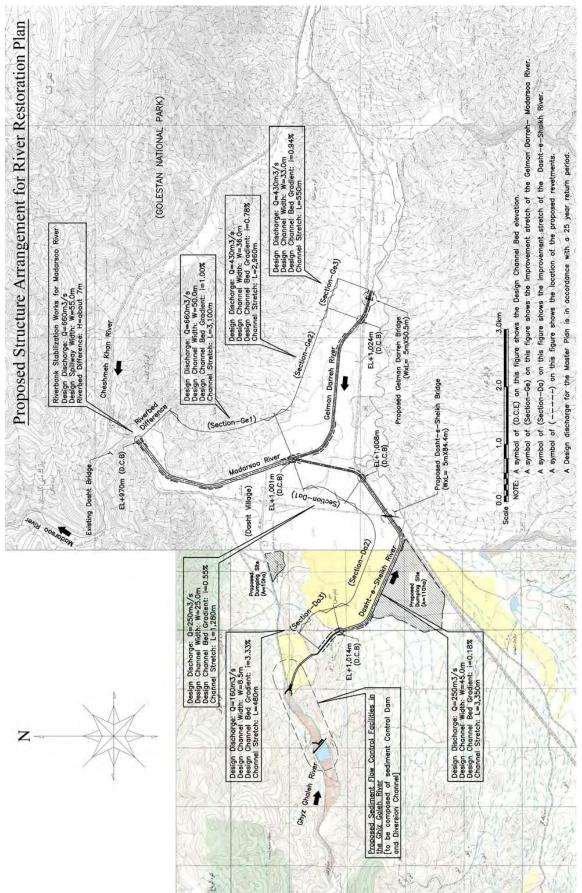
Proposed Arrangement of River Restoration and Improvement Plan
